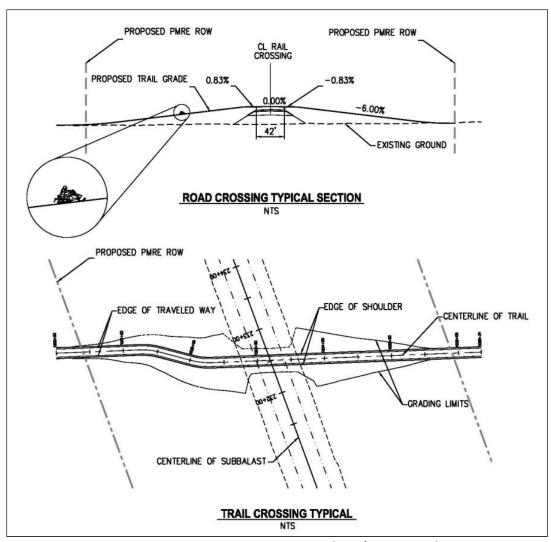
Typical at-grade crossing (trail/gravel road)
